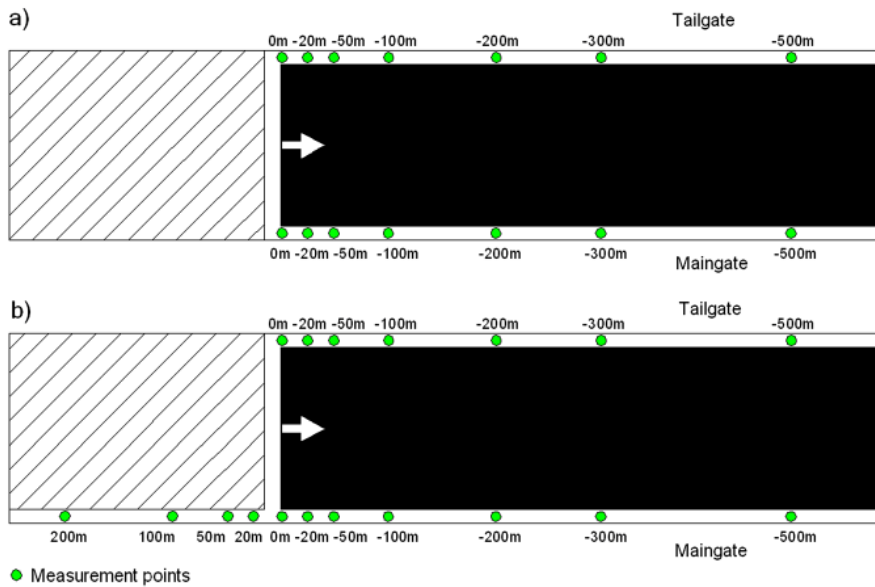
Location of measurement points in gateroads: a – for the gateroads abandoned behind the longwall face (“U” ventilation system); b – for the gateroads maintained behind the longwall face (“Y” ventilation layout)
